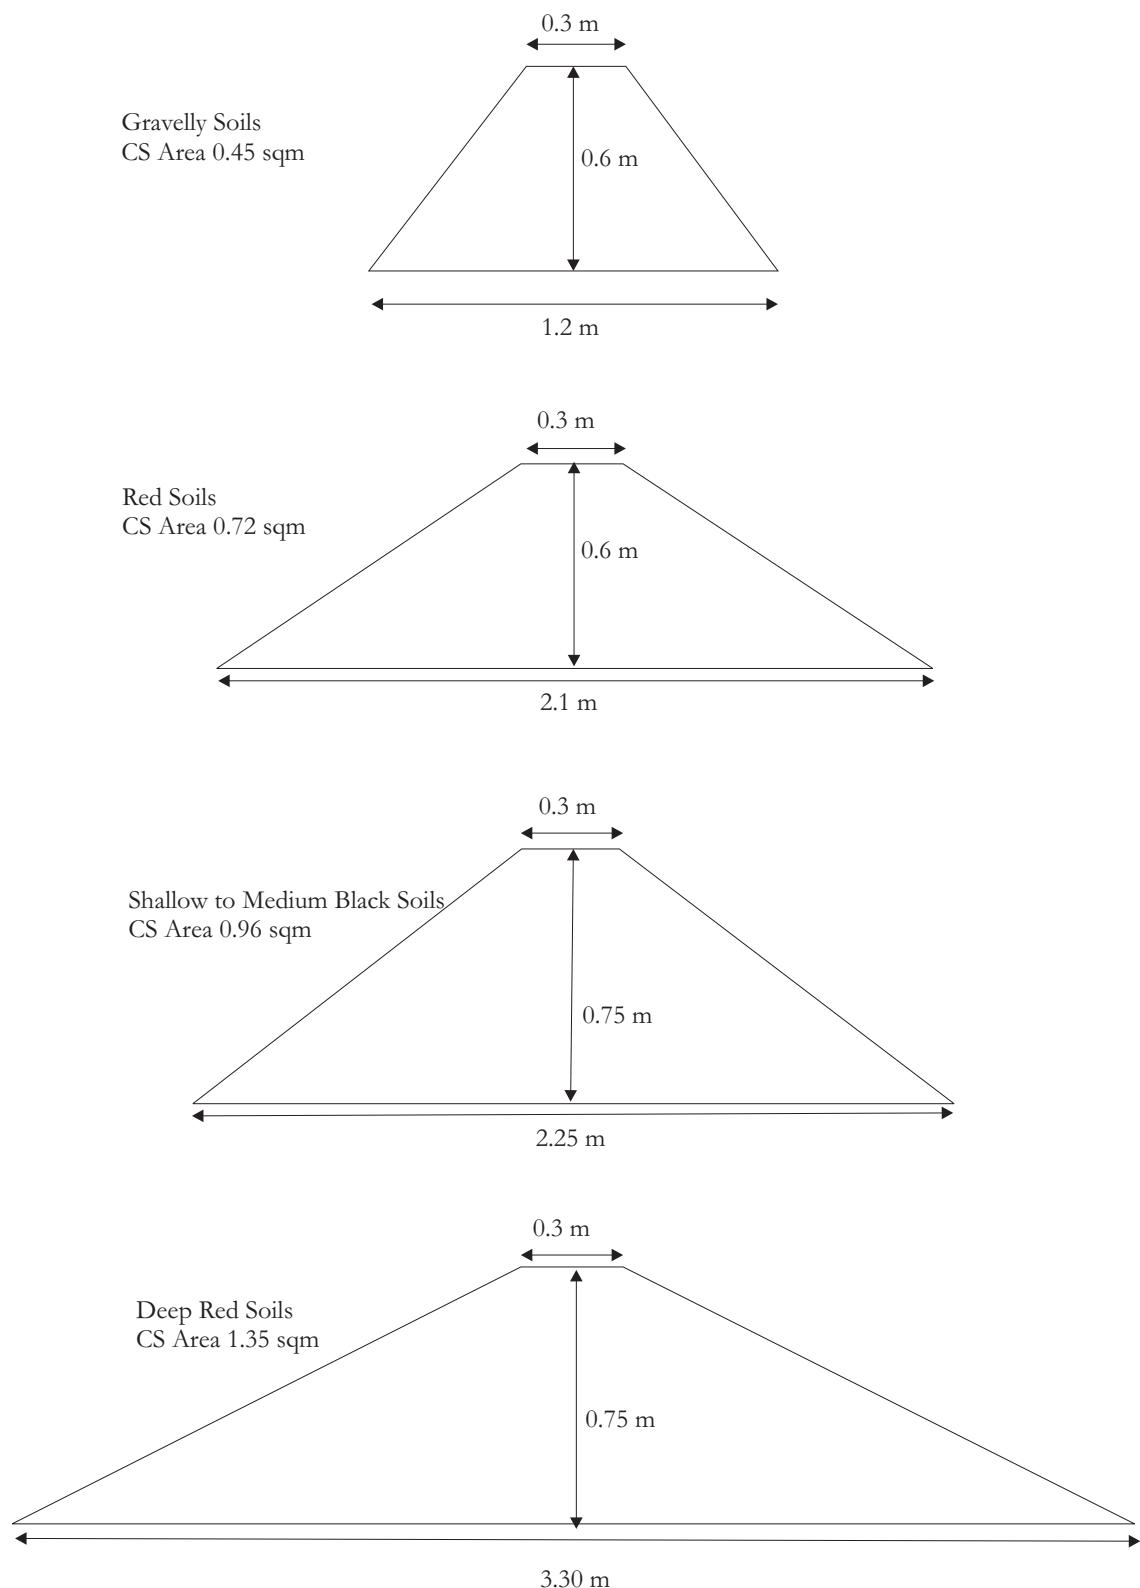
Cross sections of dams built from different types of soil. The lower the natural angle of repose of the soil used as construction material, the lower the slope of the dam and bigger its cross section
